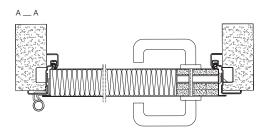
Horizontal cross-section of a large-size seamless steel door with a corner frame
